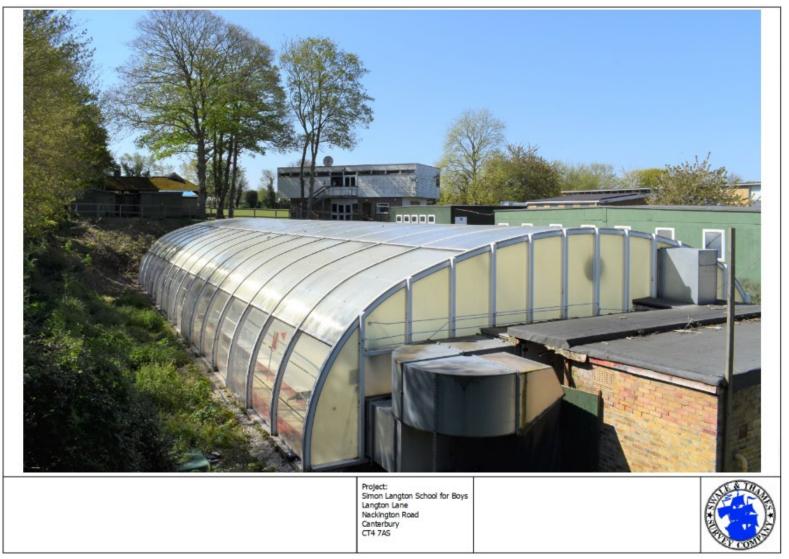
View across proposal site 4, also showing the rear buildings at proposal site 3 (facing SW)
